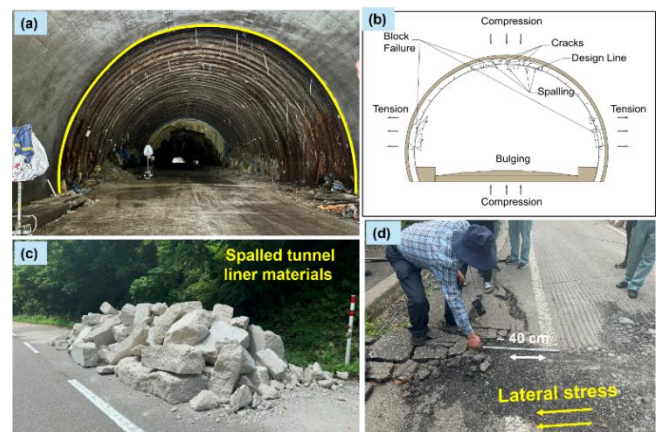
, (a) Otani tunnel damaged by the sliding mass; (b) schematic diagram of liner spalling; (c) concrete liner mocked out from the tunnel; and (d) lateral slip observed along the roadside near the tunnel entrance (date of photographs taken: August 4, 2024).
